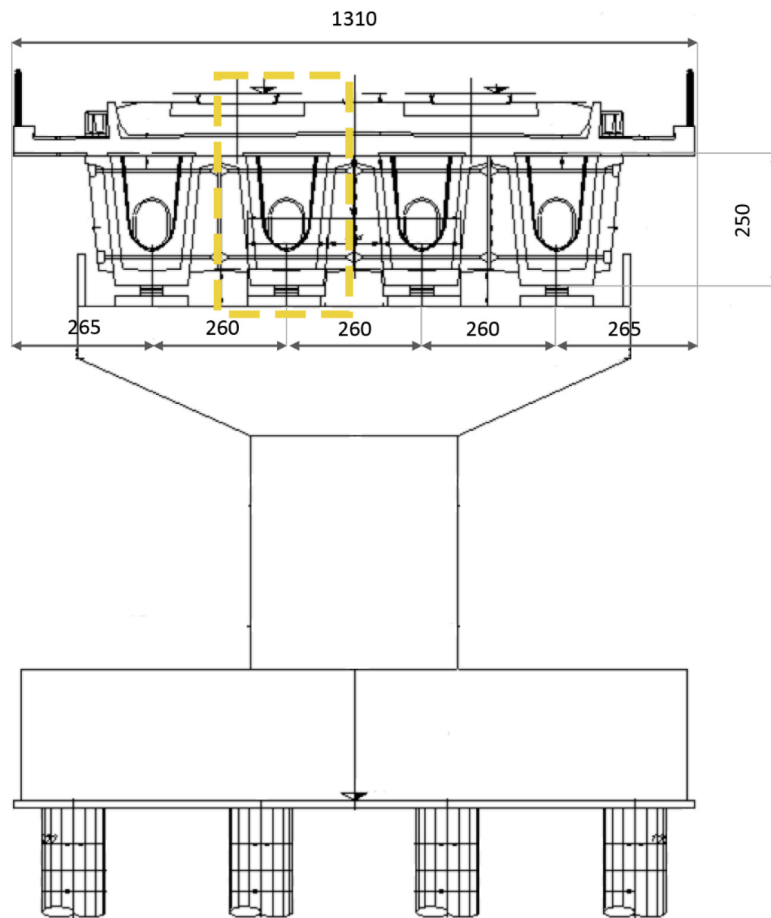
Pile elevation and a cross-section of a bridge displaying the chosen beam (cm)
